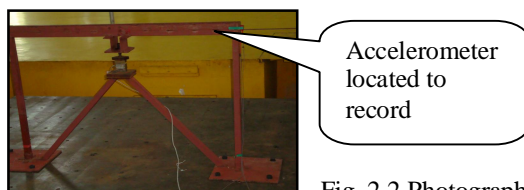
Photograph showing the accelerometer location on the steel frame.
